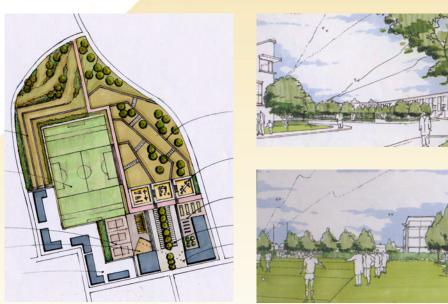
Proven technology such as heat pumps, which extract heat from the ground for use in heating (or cooling) buildings, should be explored in new building, particularly for public buildings. The outdoor coils may be located in public open spaces such as the school campus and Breagagh Linear Park
